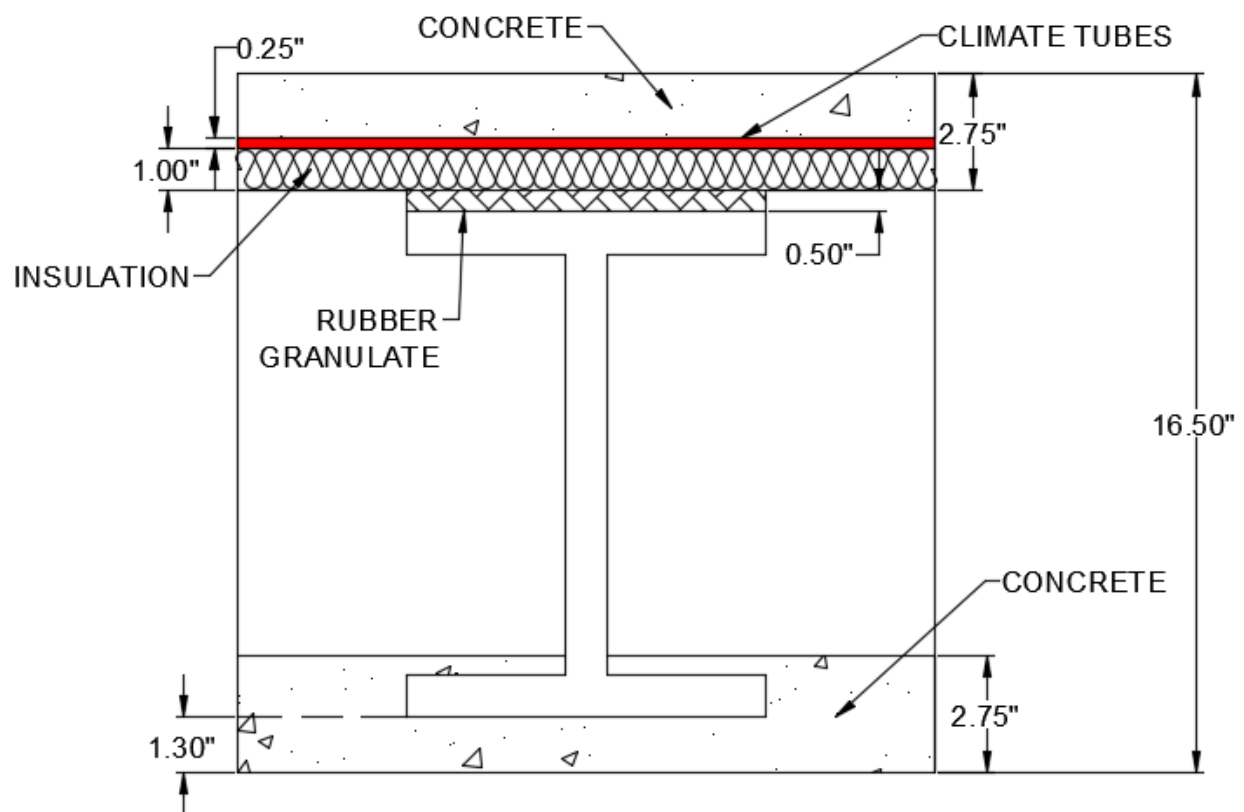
Slimline Floor Framing System Cross-Section with Climate Tubes Above
